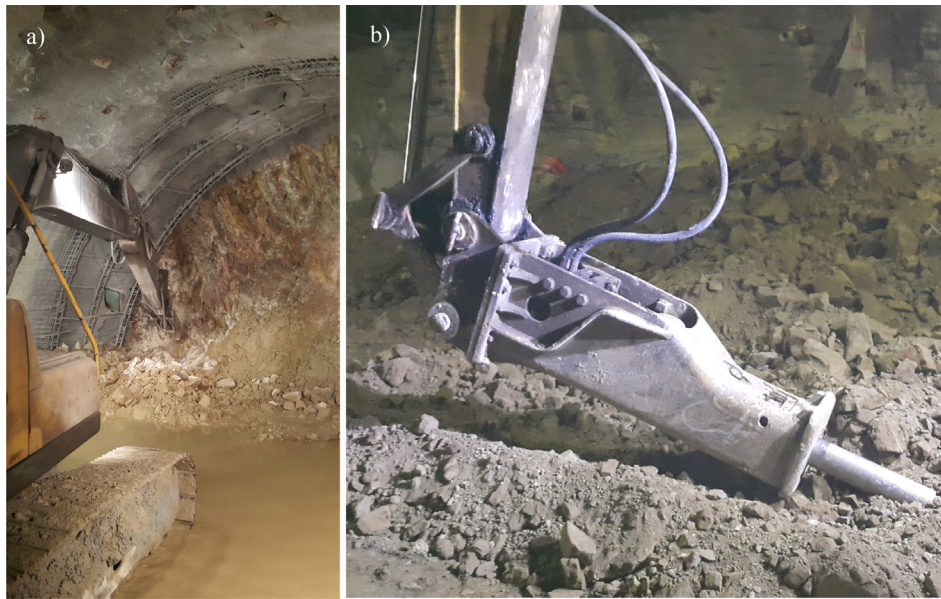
(a) A tunnel excavation with impact hammer mounted on excavator, (b) view of this impact hammer.
